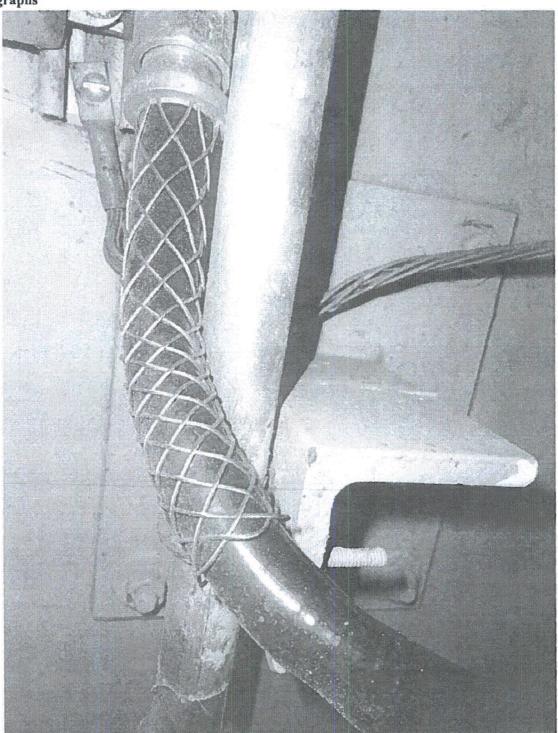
First Conduit Pair with Limited Gap (Unit 2 Torus Room Bay 9)
